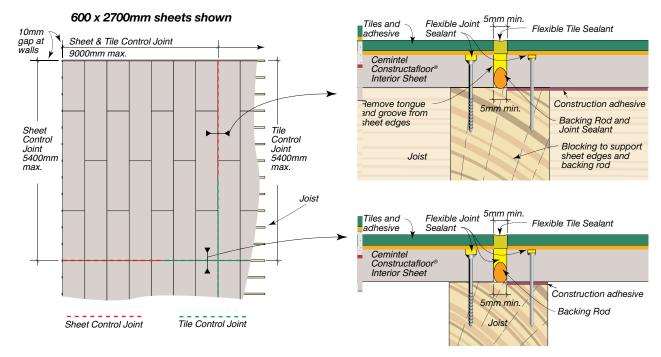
Typical Sheet & Control Joint Layout – Staggered & Direct Fix Tile System shown
